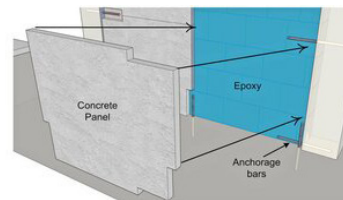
An example of precast shear wall application (Kurt, et al., 2012)
